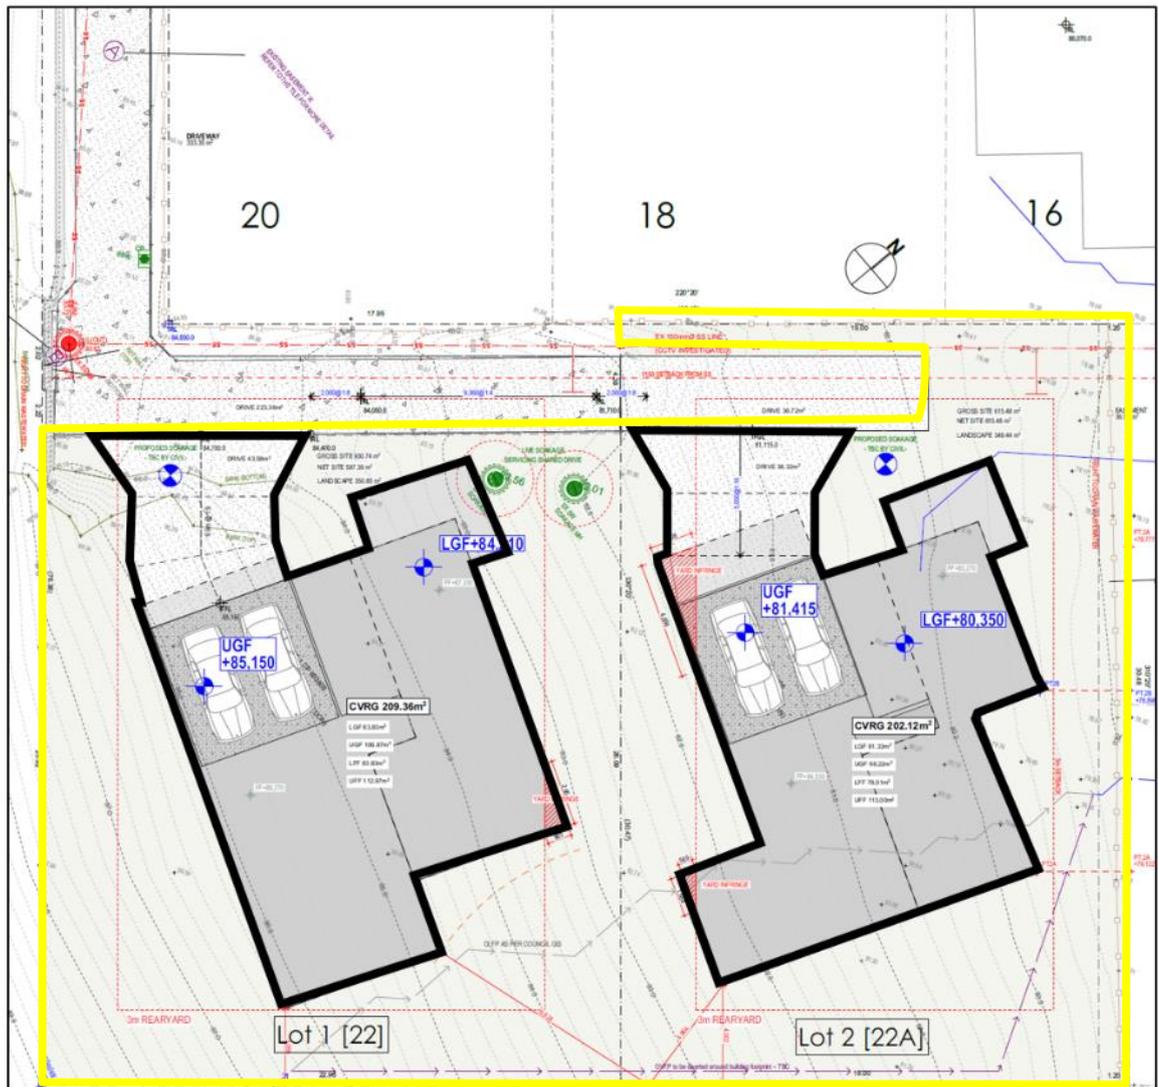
Layout plan with the house platforms that will cut of between 1-1.5m shaded outlined in black with the areas proposed for landscaping outlined in yellow (source: 10 X 10 Architects)
